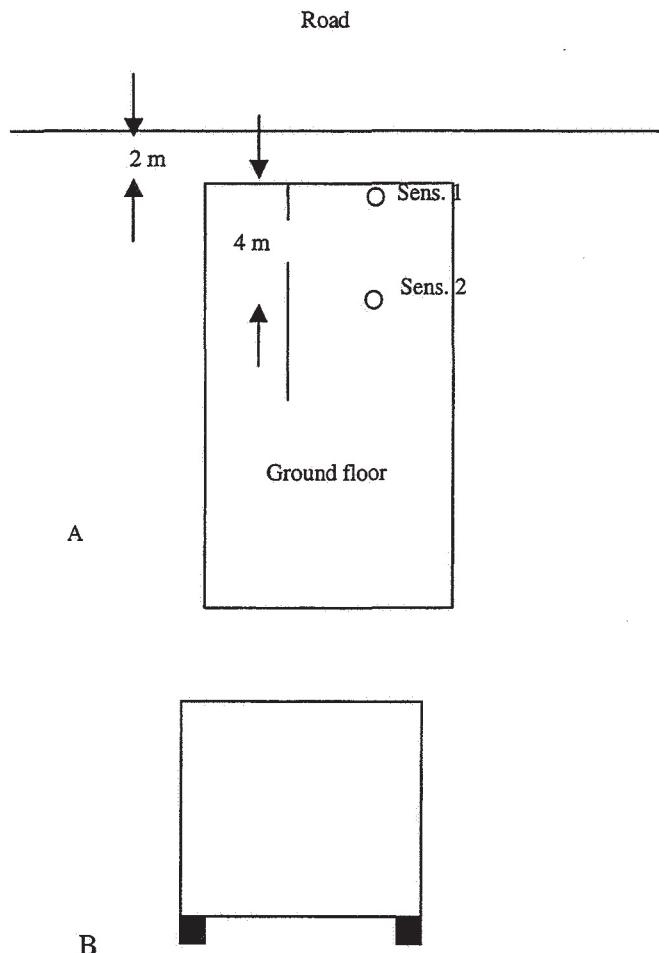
Speed ramp in The Hague: plan view (A), and cross-section of the building (B).
